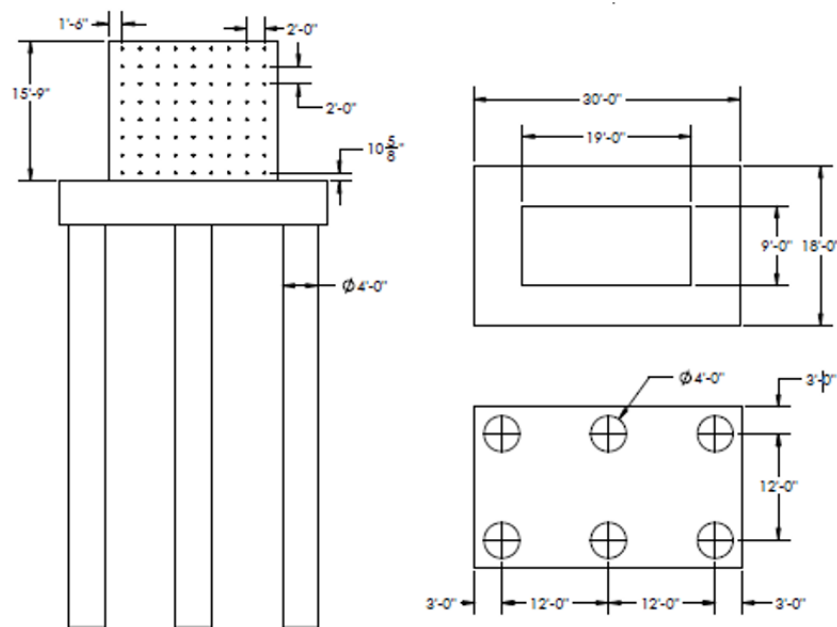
Schematic Sketches of Test Facility Reaction Wall
